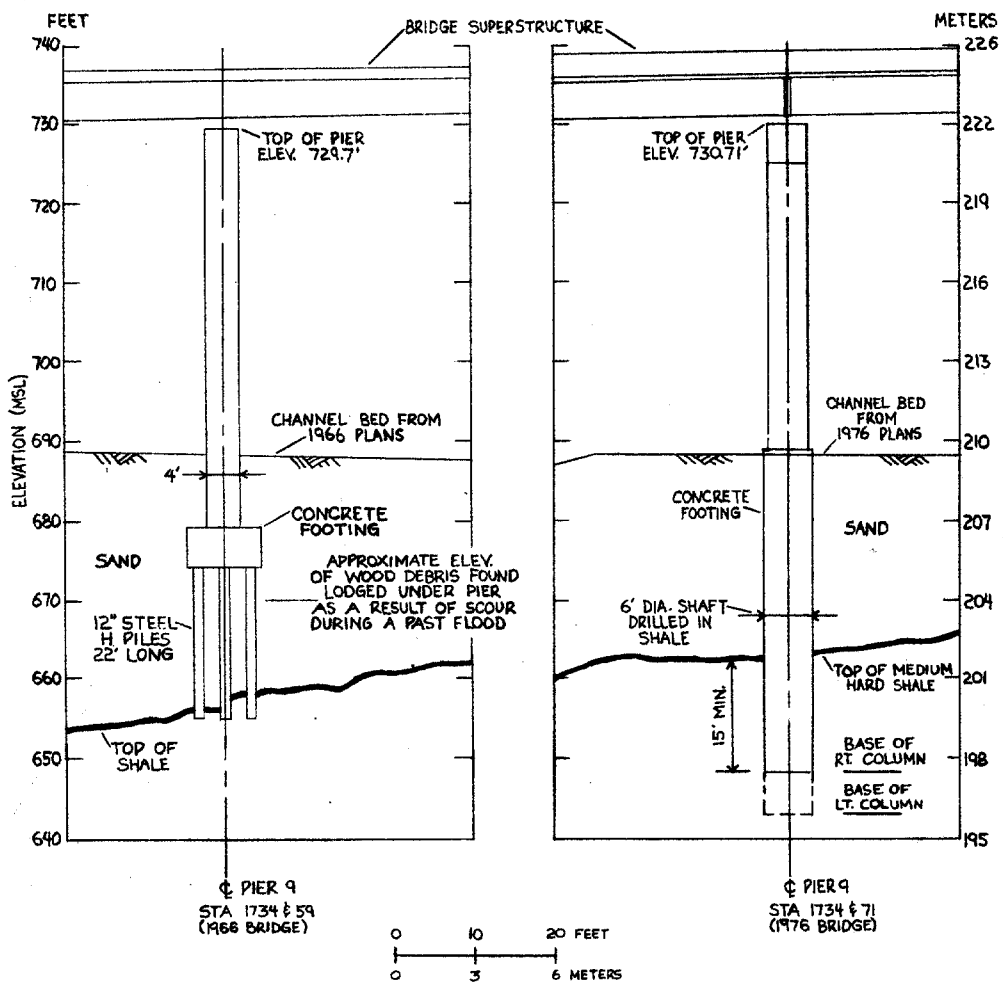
Comparison of pier 9 footing design for bridges built in 1966 and in 1976.
